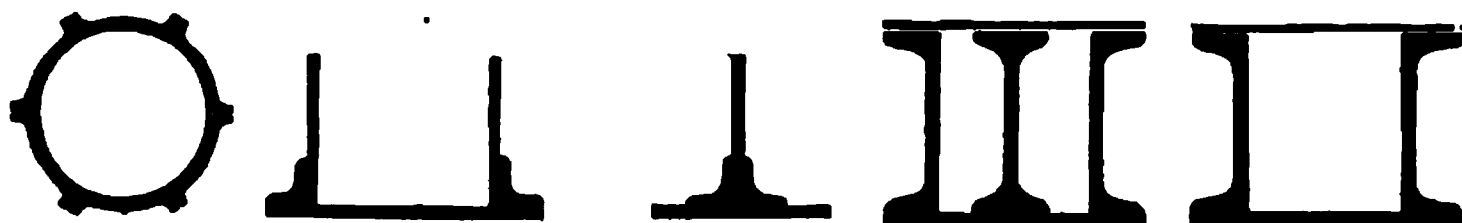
CROSS SECTIONS OF COLUMNS.
